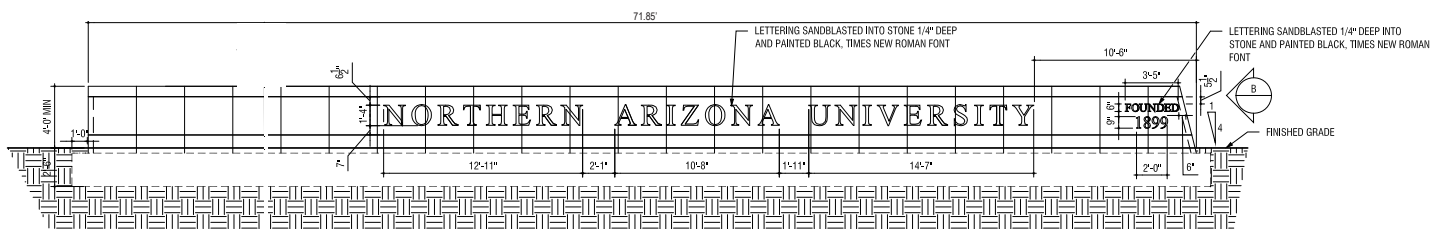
Figure B. Eastern Stone Wall Elevation with Signage Elevation South Face
